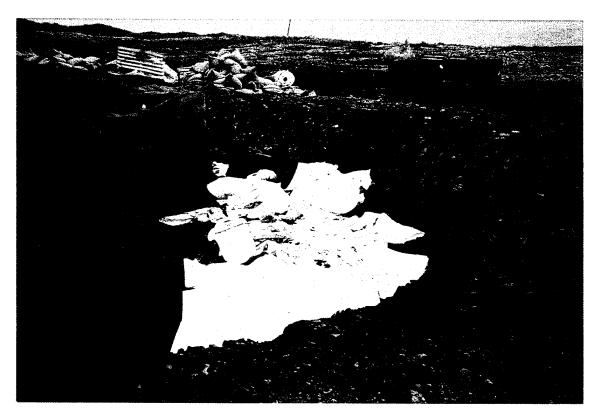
During late June 1995, the backfilled excavation was fertilized and seeded.
